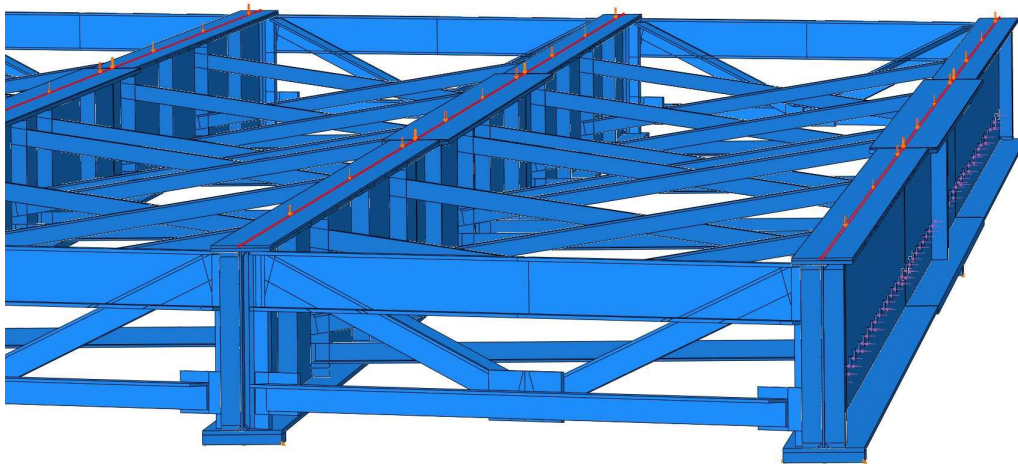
Deck dead load and construction live load applied to a bridge system model
